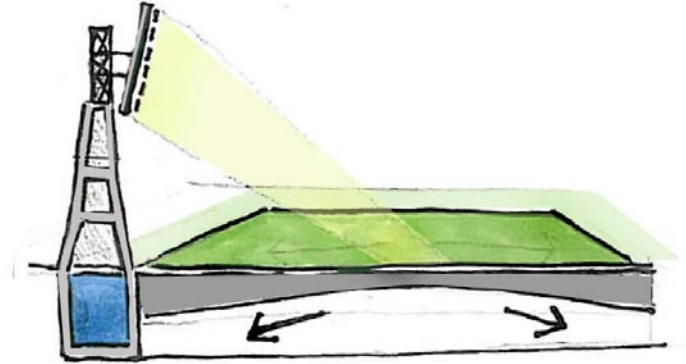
Diagrammatic section showing water storage in base of towers, Author, 2008
